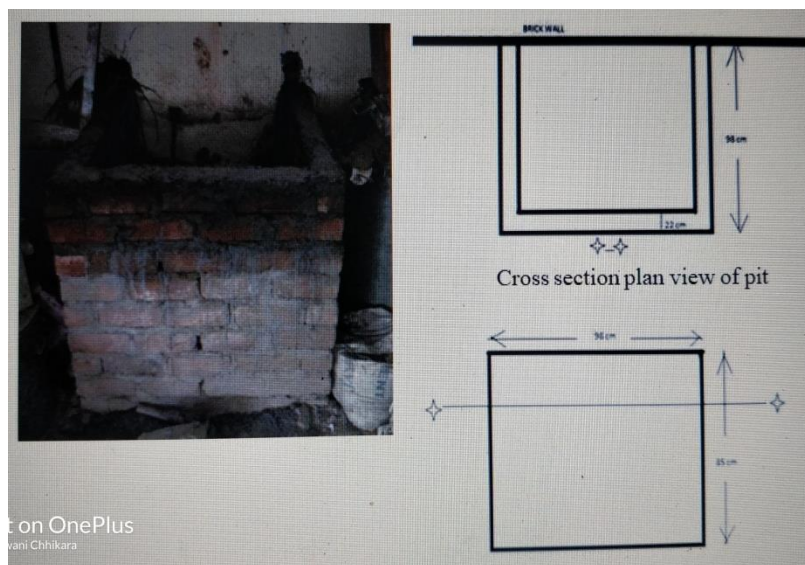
Real image of pit on left side, plan and side view of pit on right side{DTU thesis}[4]
